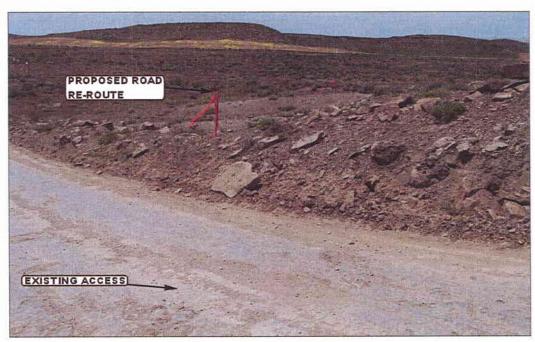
PHOTO: VIEW FROM BEGINNING OF PROPOSED ROAD RE-ROUTE
